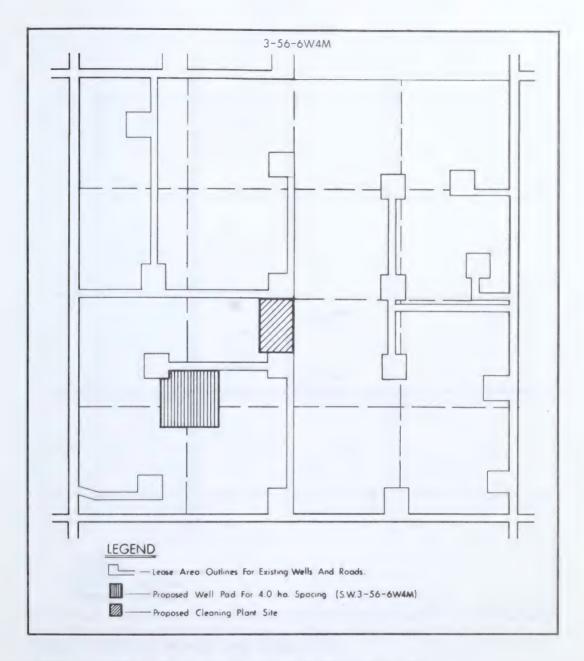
SECTION 3-56-6W4M AND PROPOSED SURFACE FACILITY LOCATIONS.
